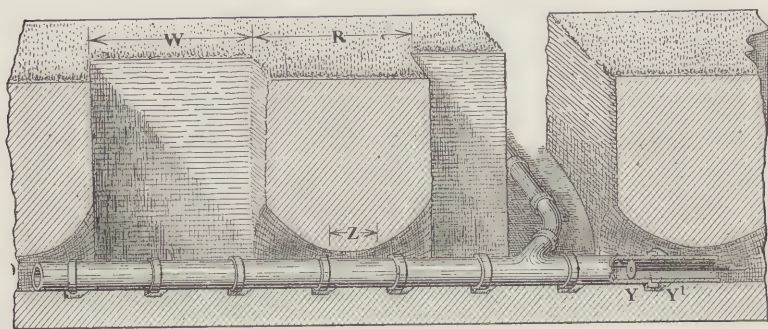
LONGITUDINAL SECTION OF POCKET-AND-TUNNEL TRENCH FOR SEWERS
